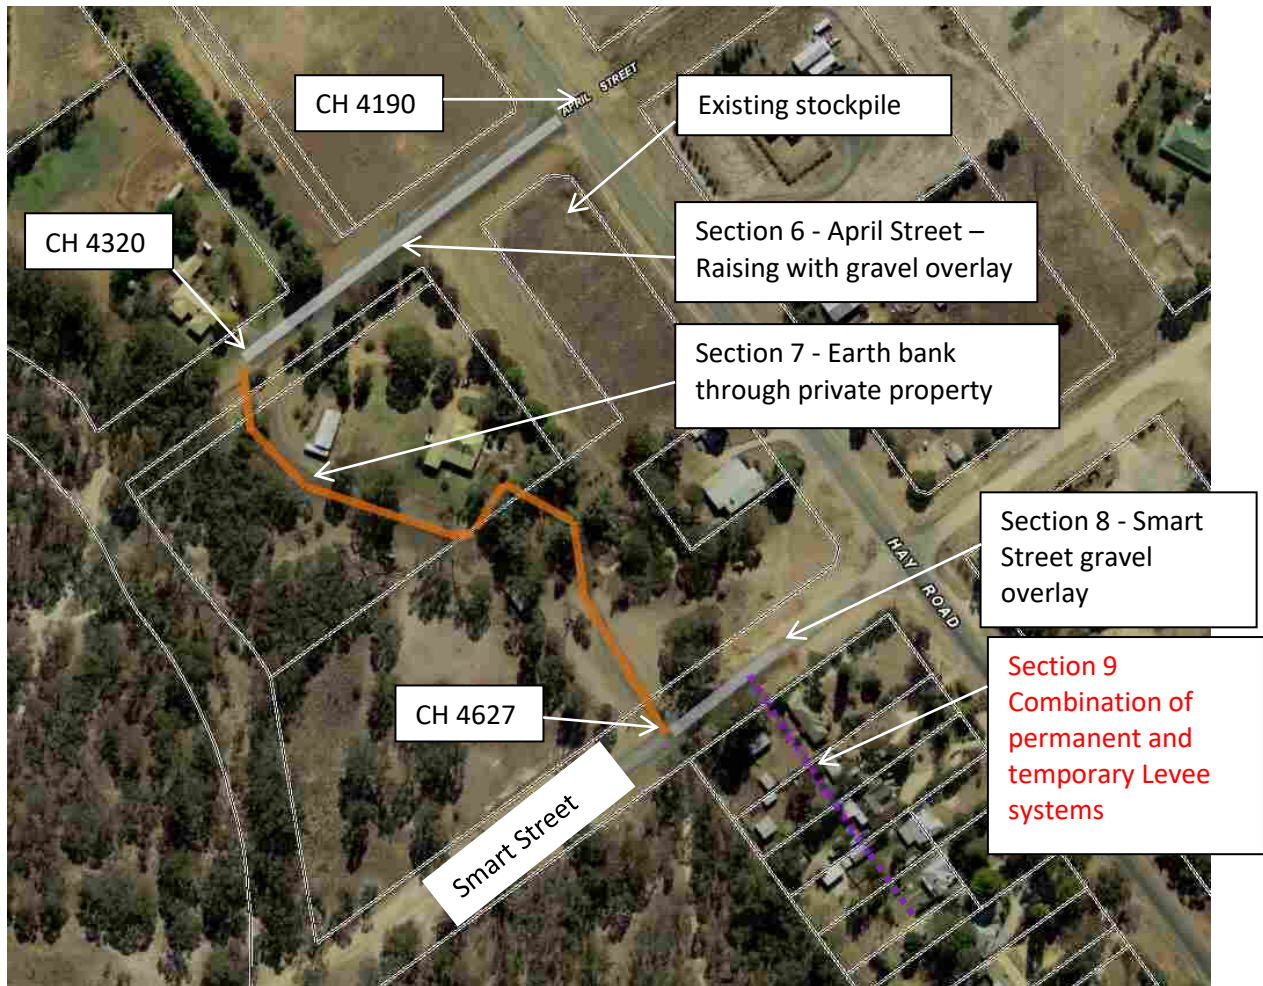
Section 6- April Street upgrade and Section 7 through private property
